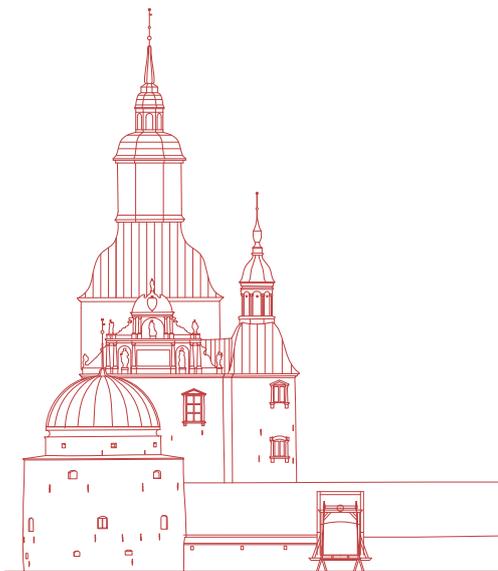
Side elevation of the castle, 1:1000. The side elevations of the castle are characterized by a juxtaposition of forms which yet attain an outstanding architectural unity.
